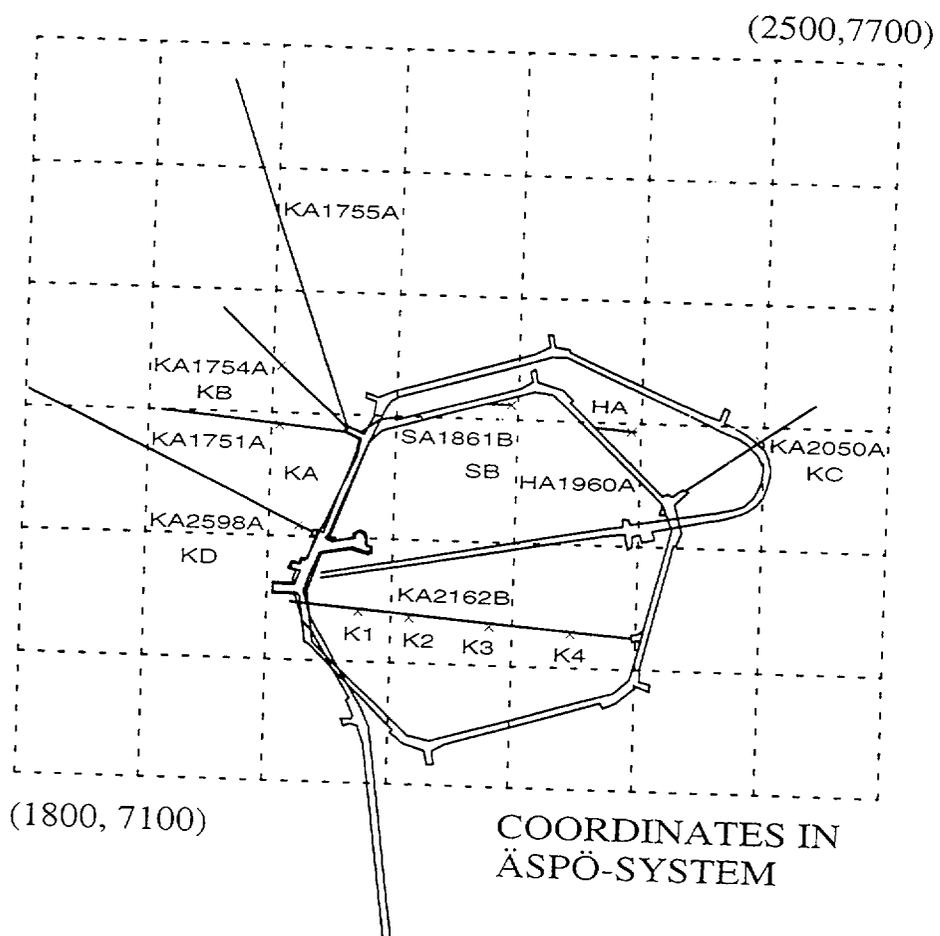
Tunnel layout. Äspö HRL planned TBM-tunnel in black.
